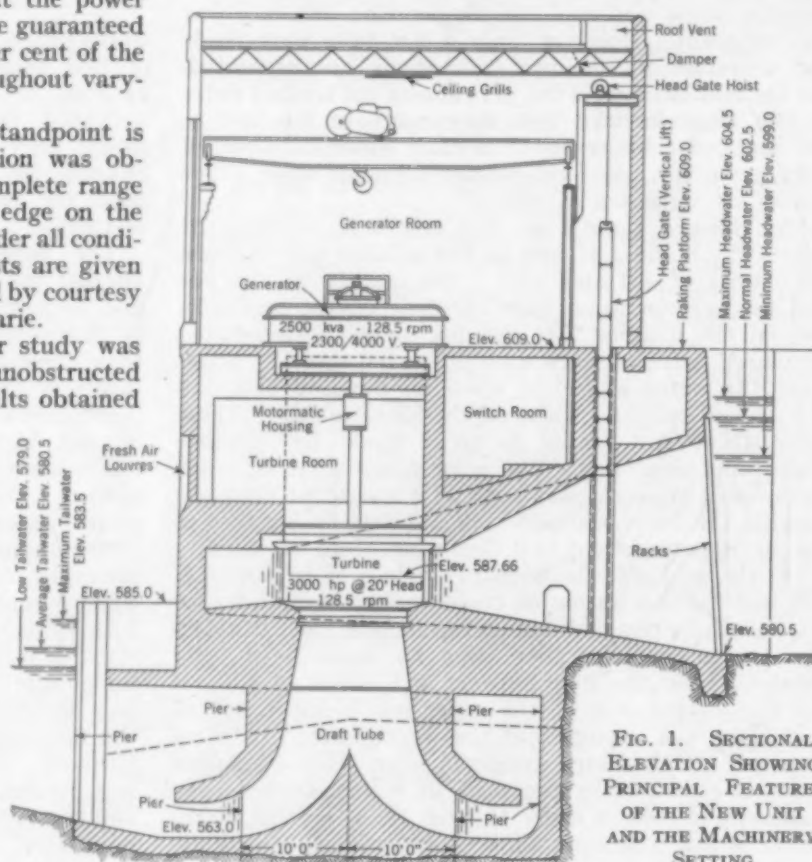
SECTIONAL ELEVATION SHOWING PRINCIPAL FEATURES OF THE NEW UNIT AND THE MACHINERY SETTING
